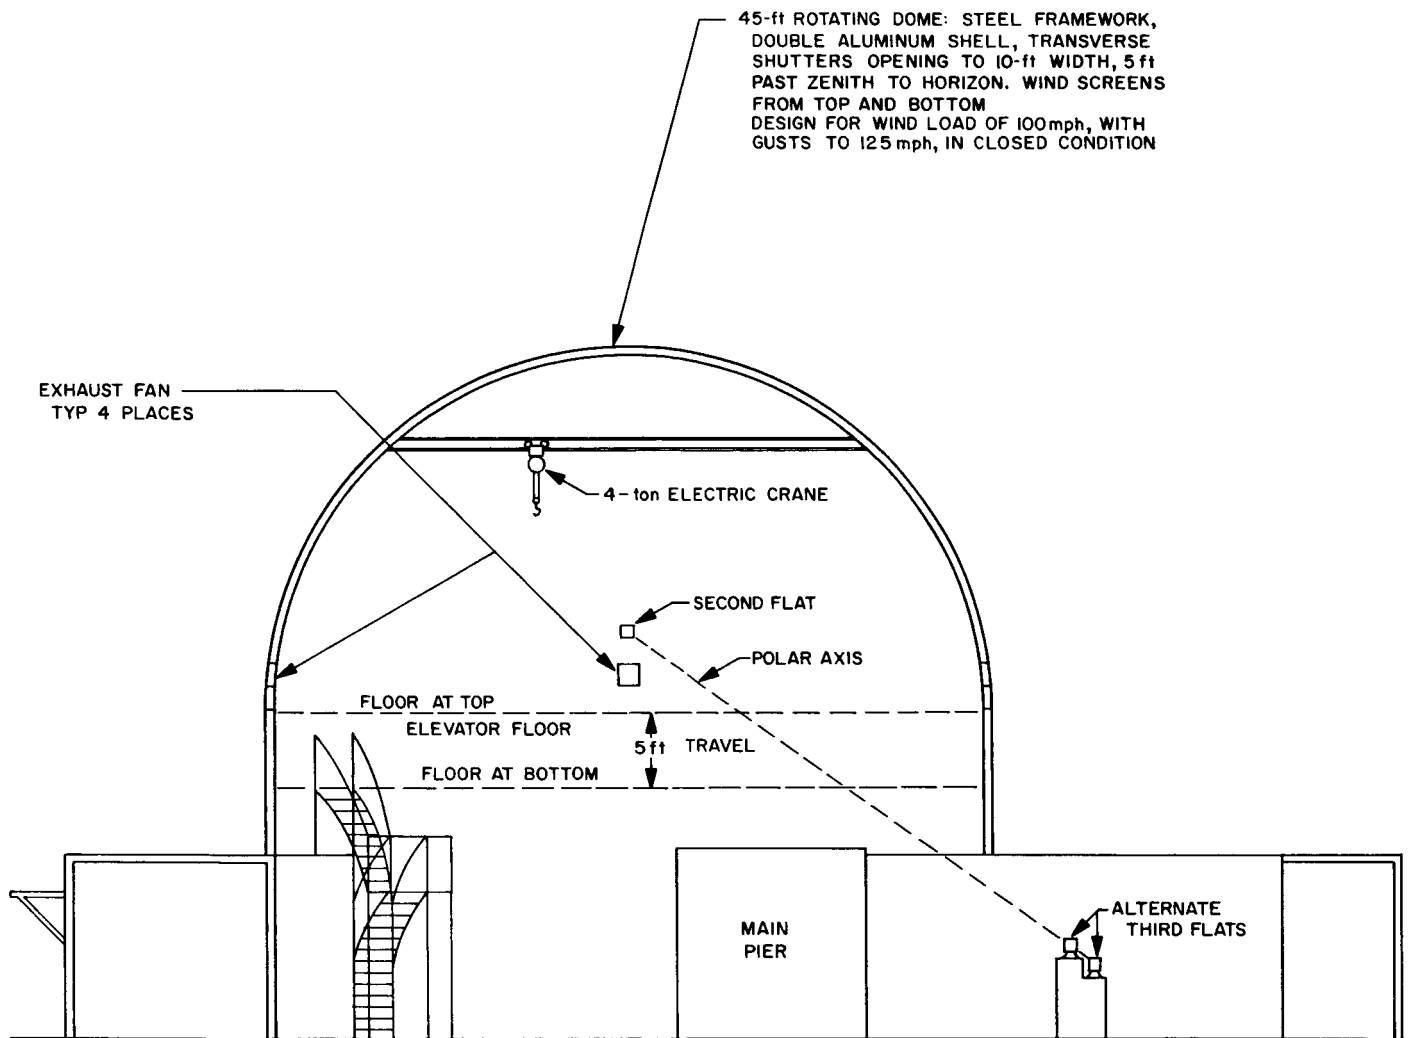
Schematic drawing of telescope dome and associated Coudé rooms, etc., sectional view
